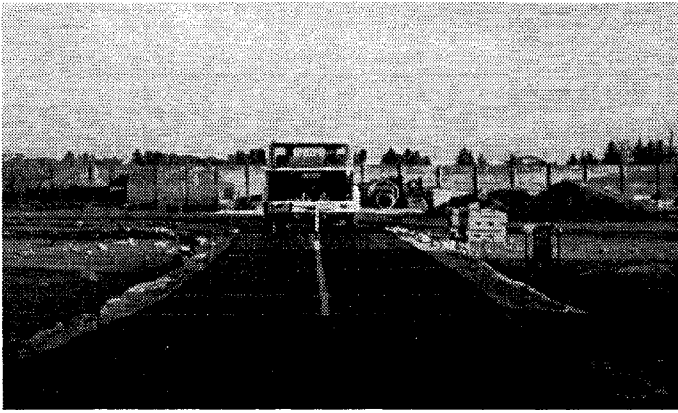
Full scale in-ground testing of geosynthetic reinforced flexible pavements
